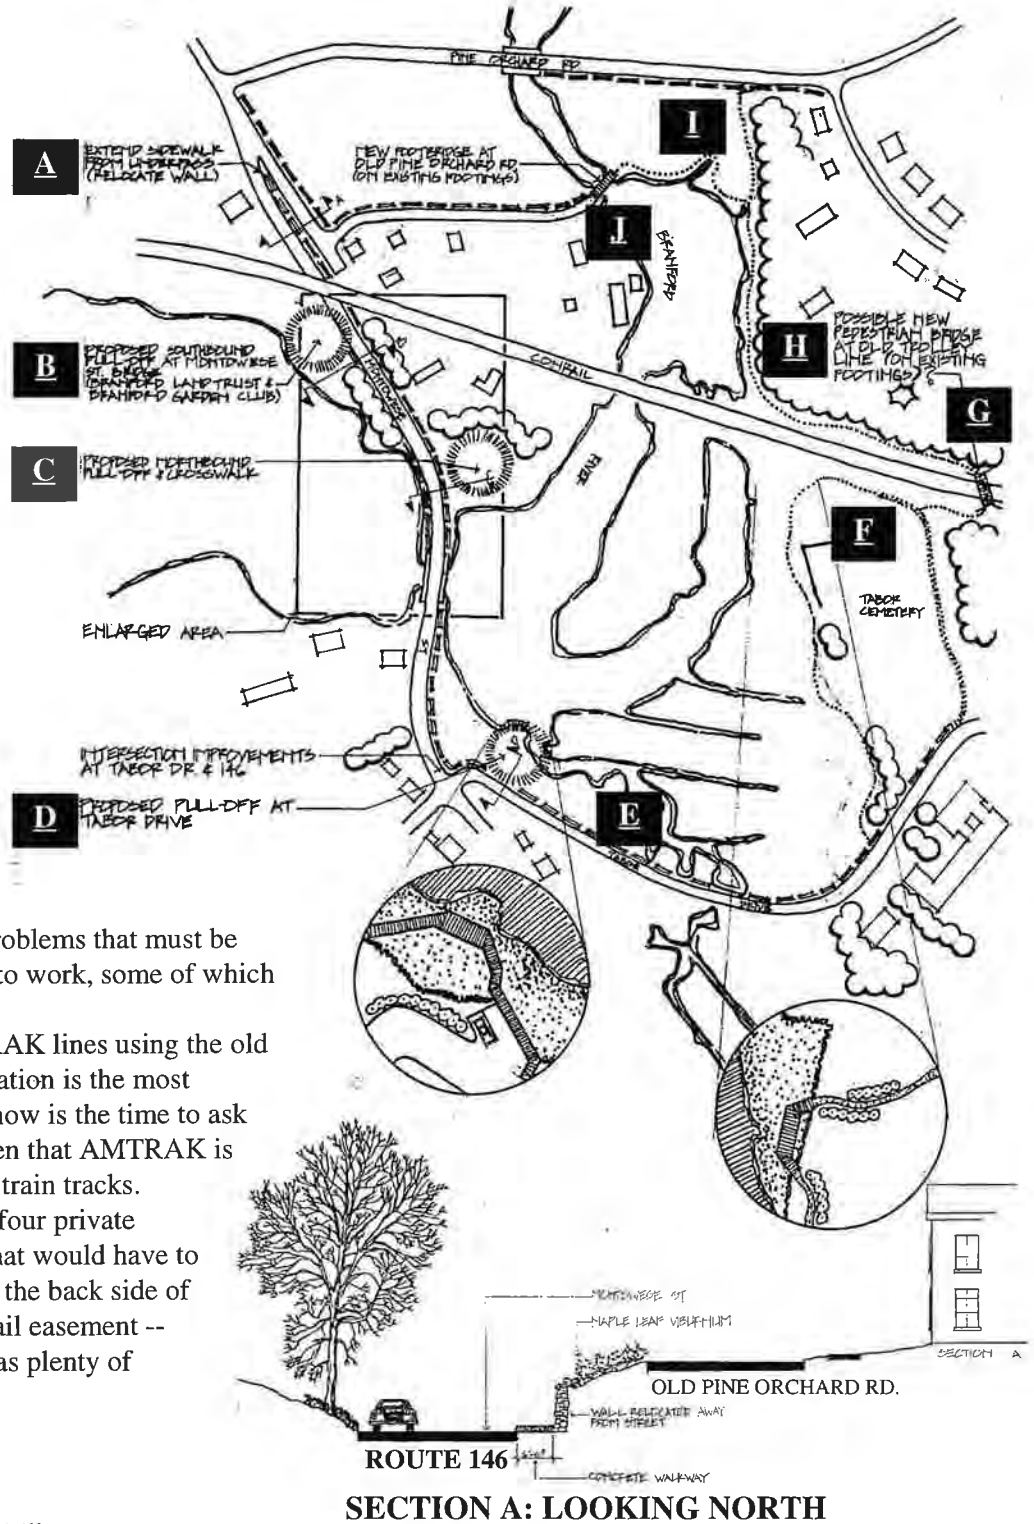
Concept Plan (top) illustrates long term approach to enhancing the Montowese St. Bridge area into a key focal point for a Branford River Greenway. Section A shows how the existing wall could be moved back to make room for a wider sidewalk enabling pedestrians to walk more safely into town. Section C shows how a pull-off could be constructed on the north bound side of Montowese St. to provide better access to the Branford River.
